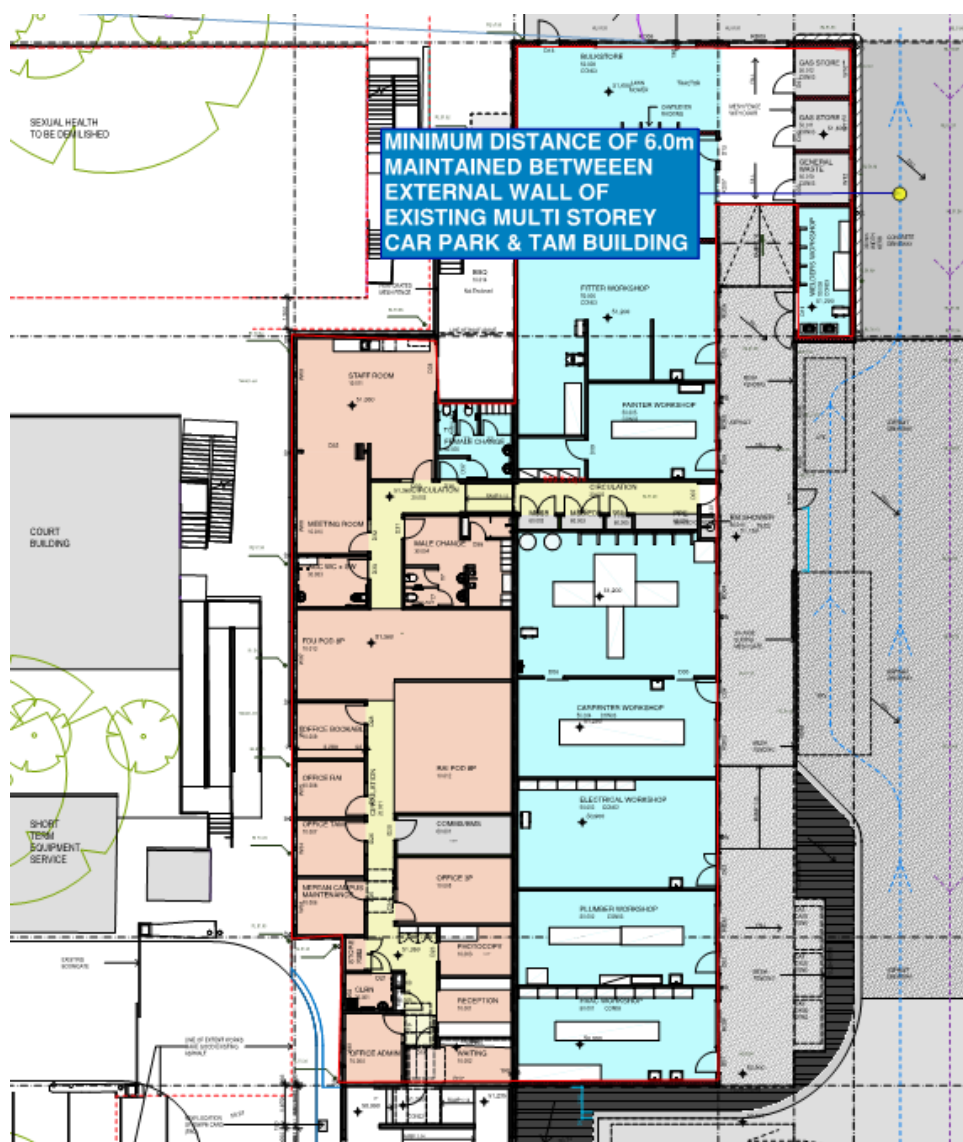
Location of TAM facility in relation to existing multi storey car park to the east
